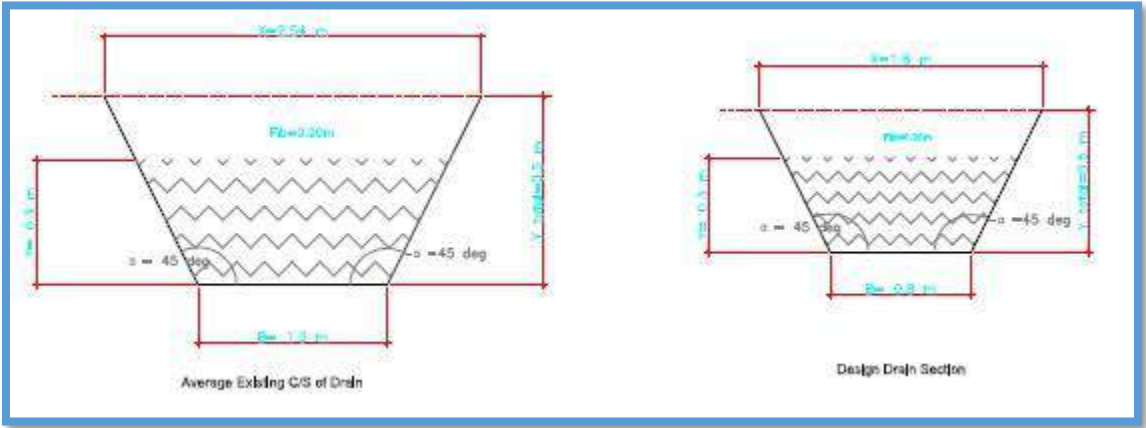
Typical Drain Cross Section for Farm Roadside Earthen Drains
